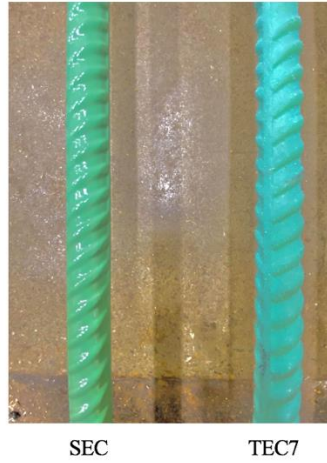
TEC7 and SEC bars used for the bridge deck shrinkage test.
